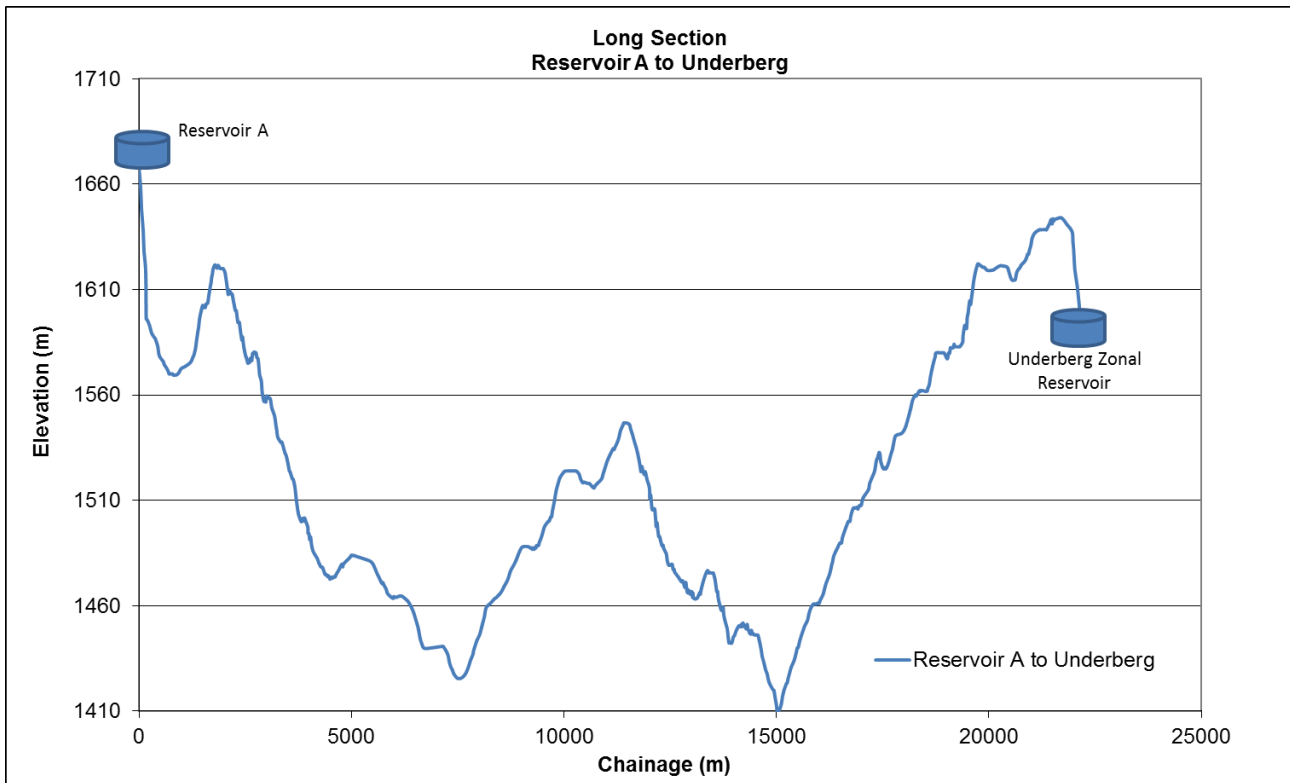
Longitudinal Section - Reservoir A to Underberg
